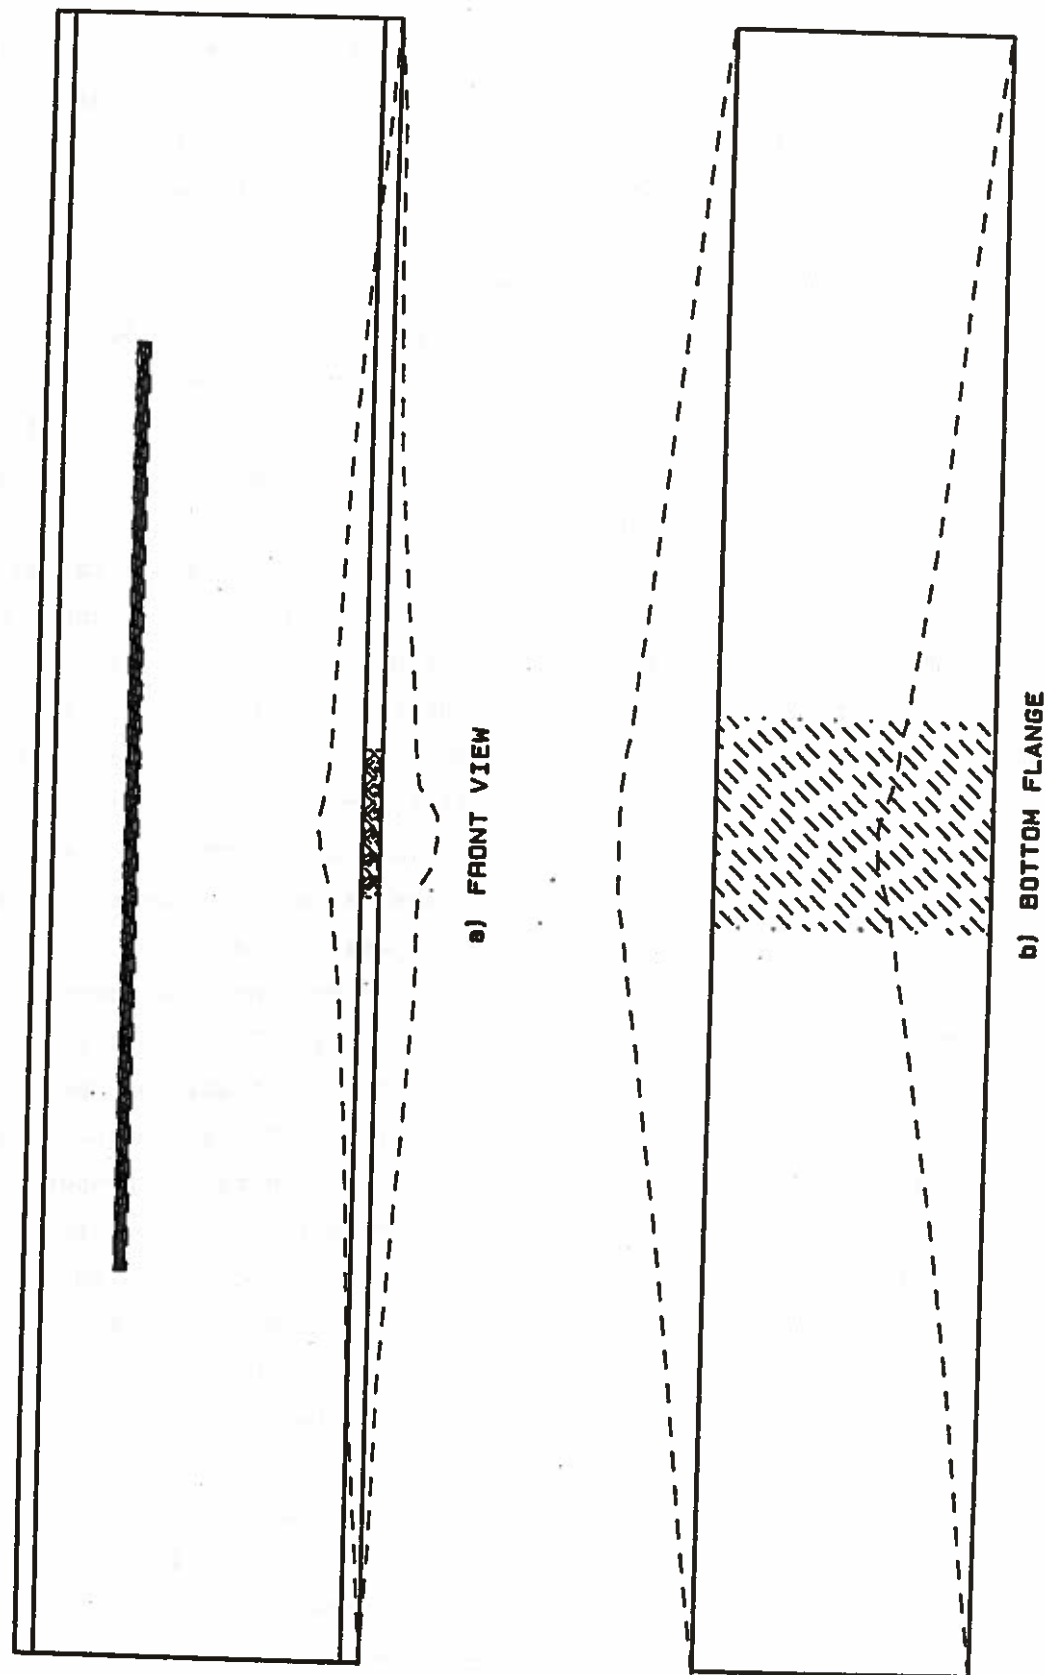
Identification of the yield zones in the damaged girder SB-1.
